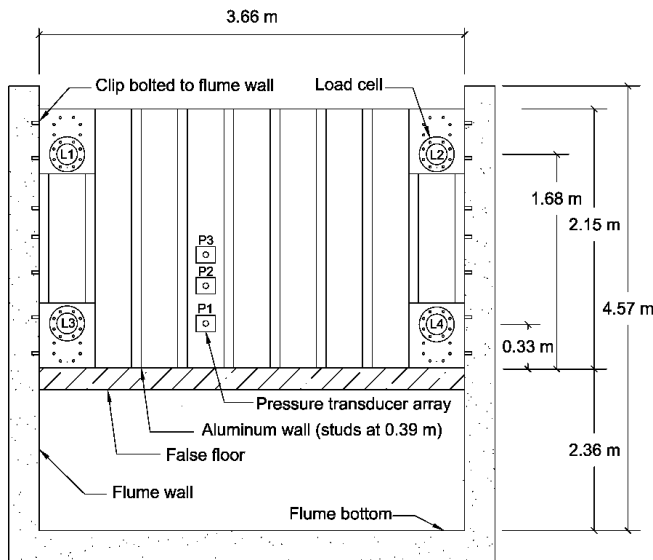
Elevation of test specimen with instrumentation: *L* denotes load cells and *P* pressure transducers.
